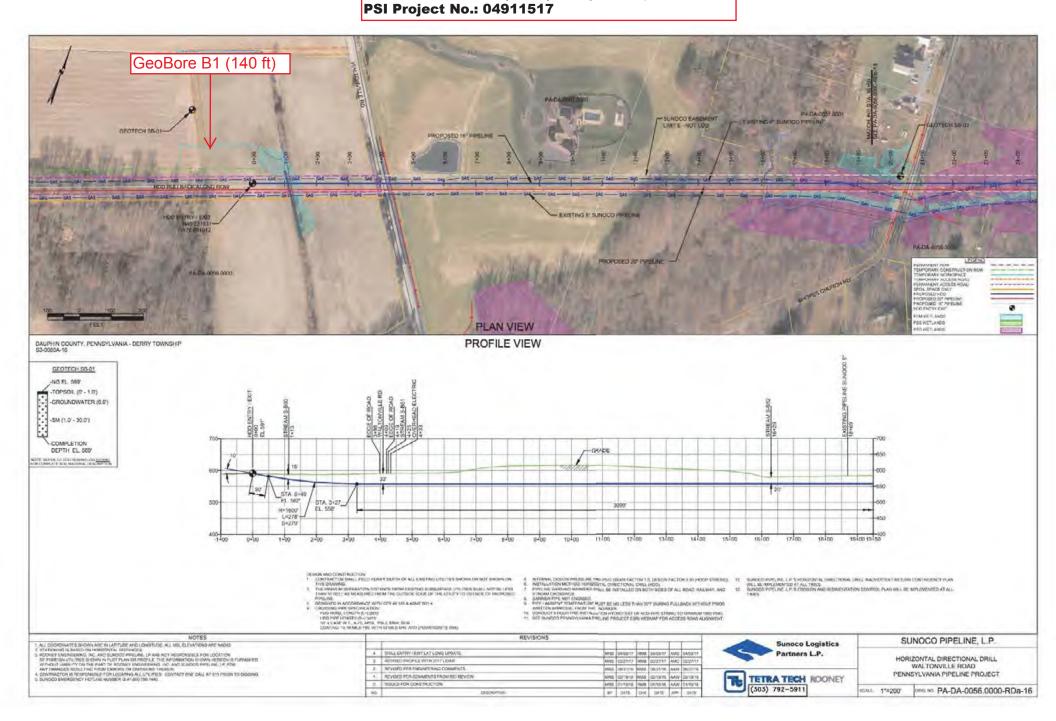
B: BORING LOCATION PLAN "Waltonville Road" (PPP4)- Dauphin Co, PA
